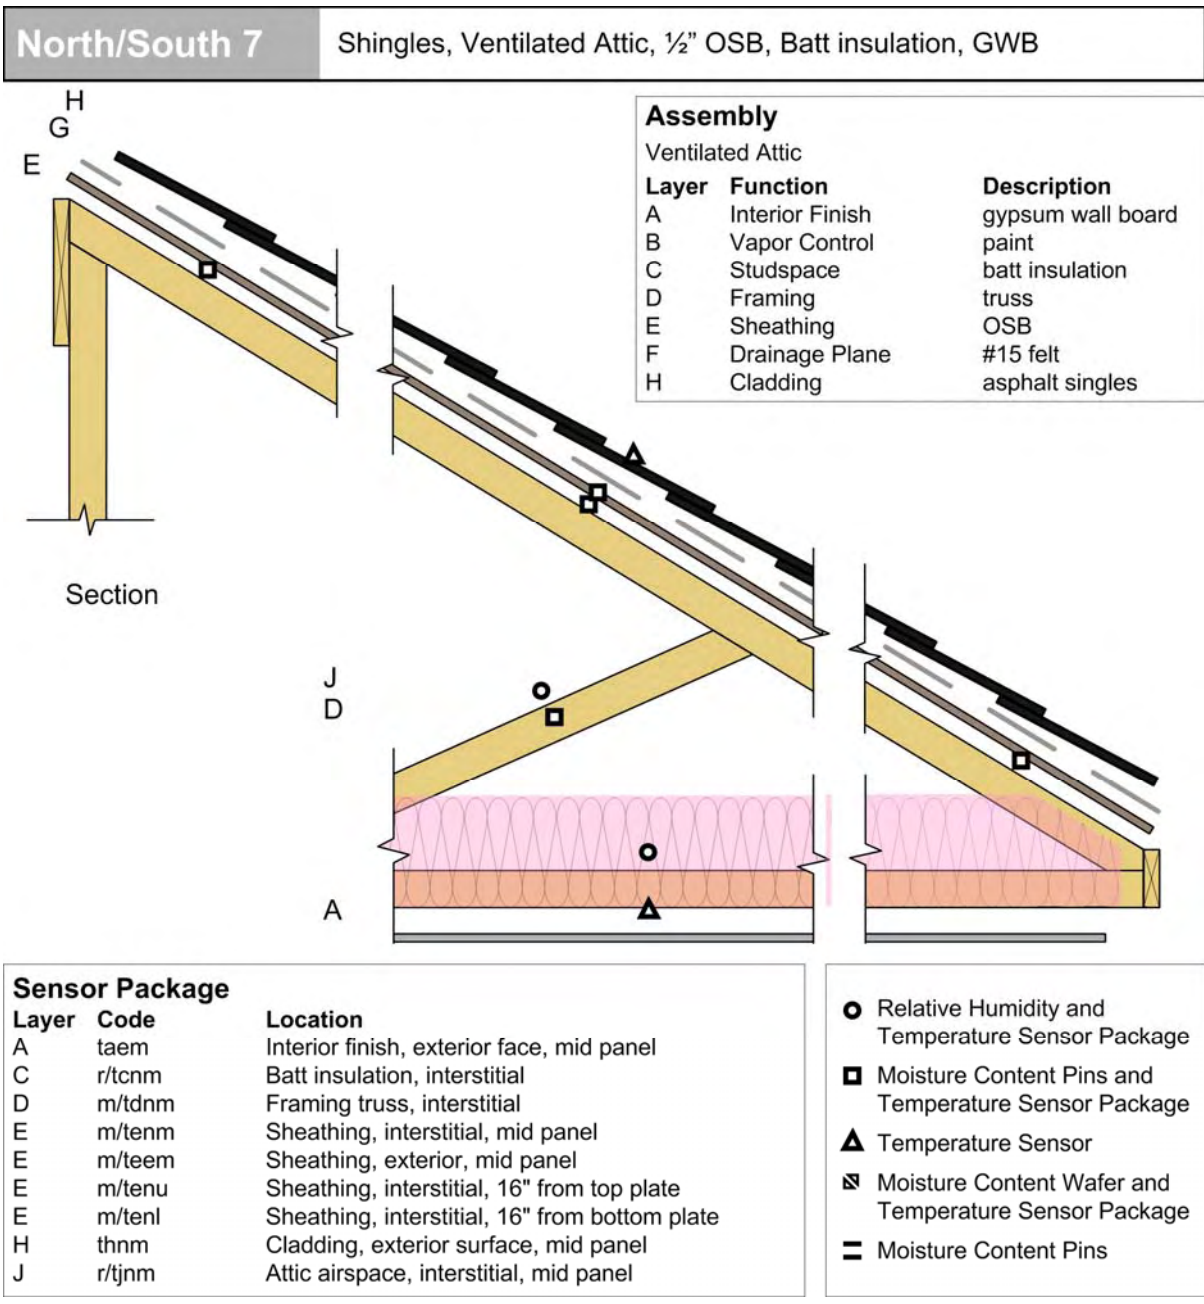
Atlanta Roof 7: Poorly Ventilated Attic, construction and sensor layout
